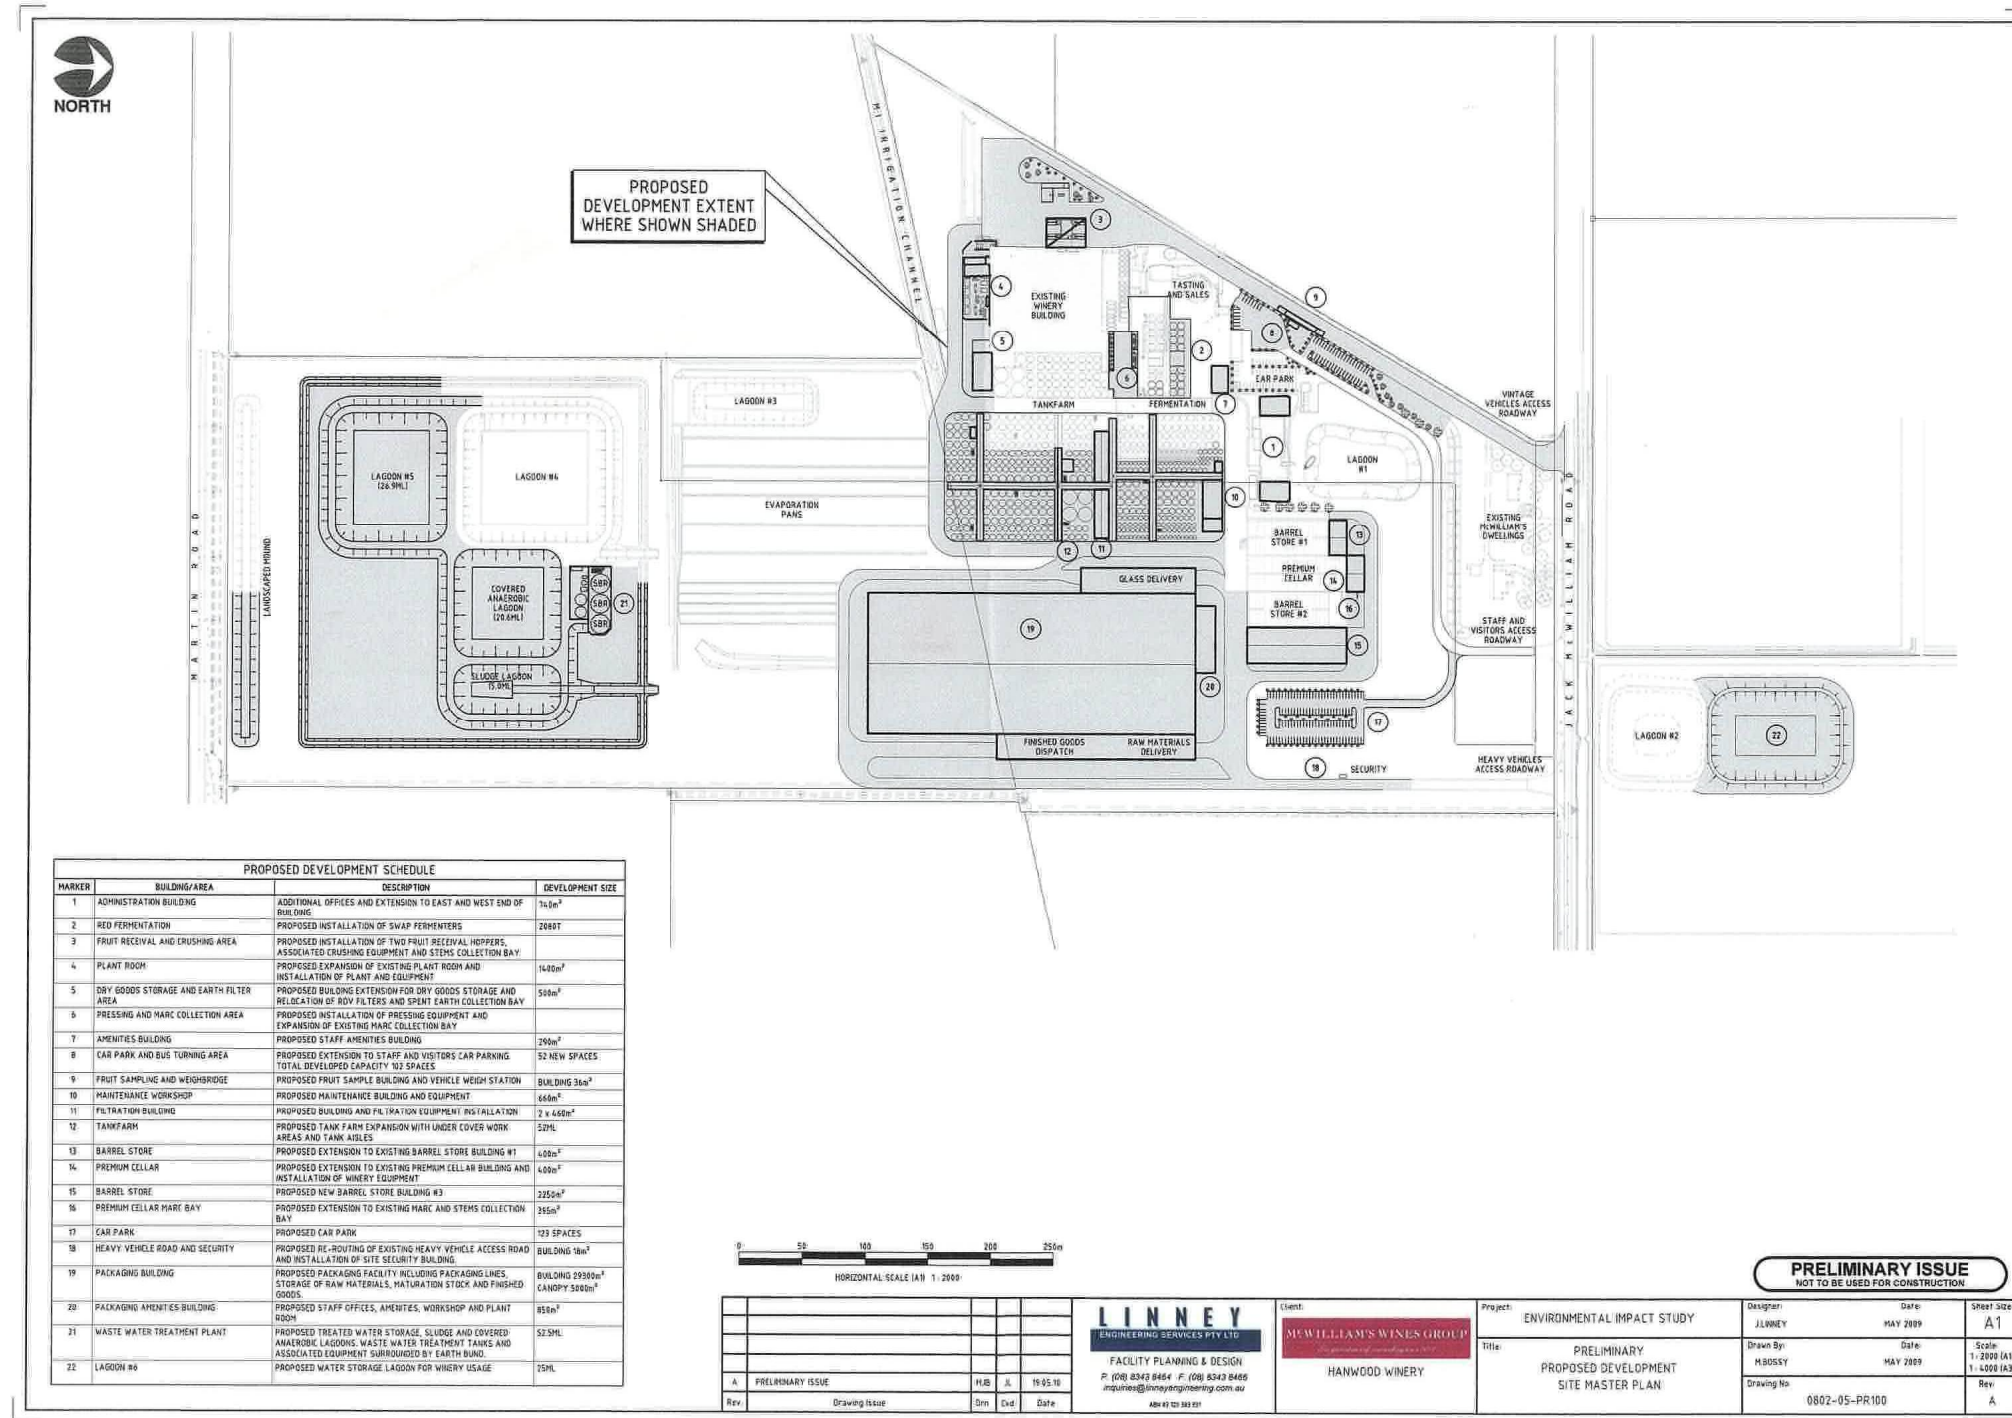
Layout of existing winery and proposed expansion (proposed expansion extent shaded).
